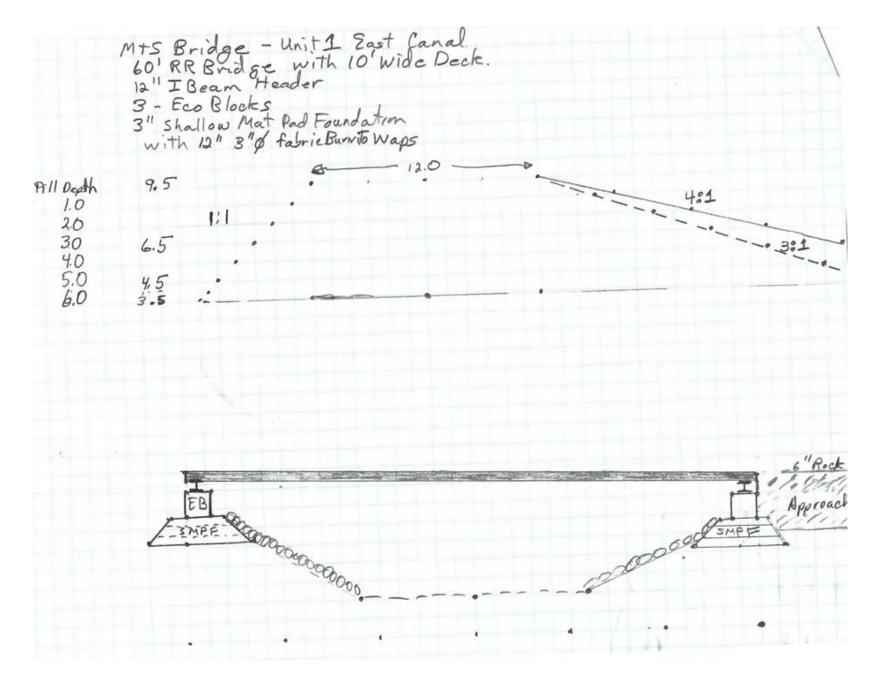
Unit 1 S. Canal S.E. pasture access bridge cross-section drawing.
